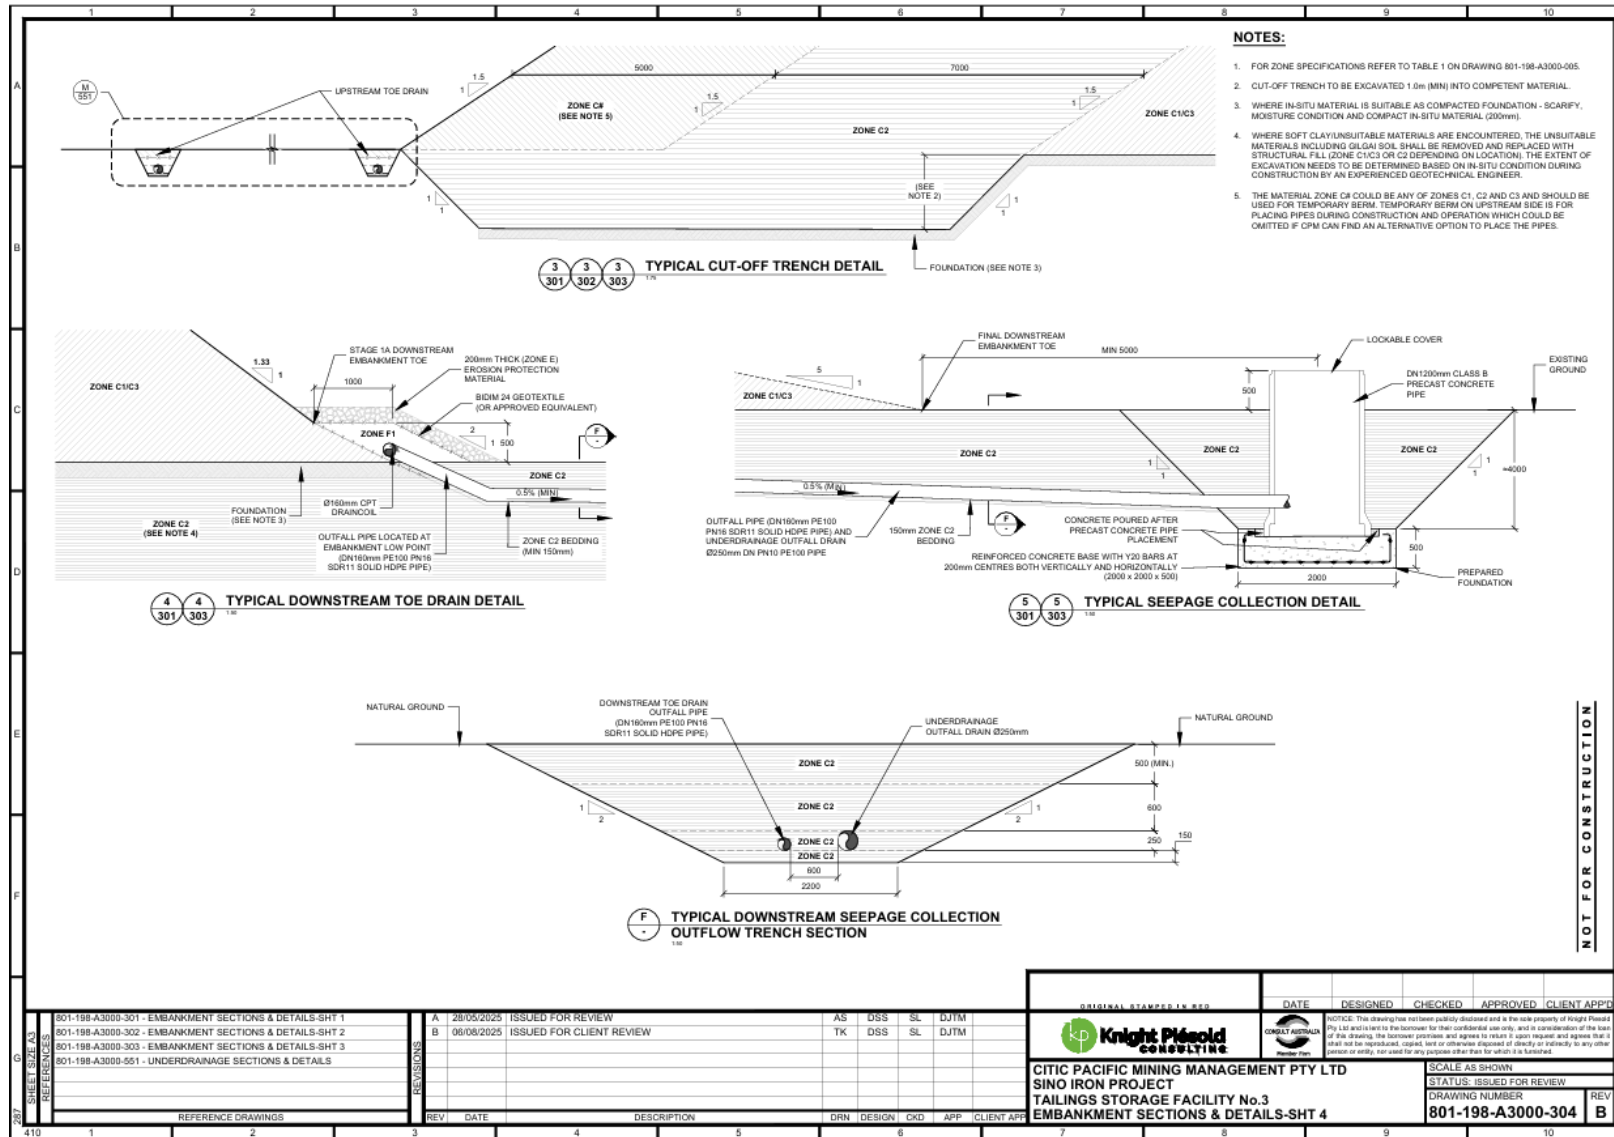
TSF 3 cut-off trench, downstream toe drain and seepage collection detail
